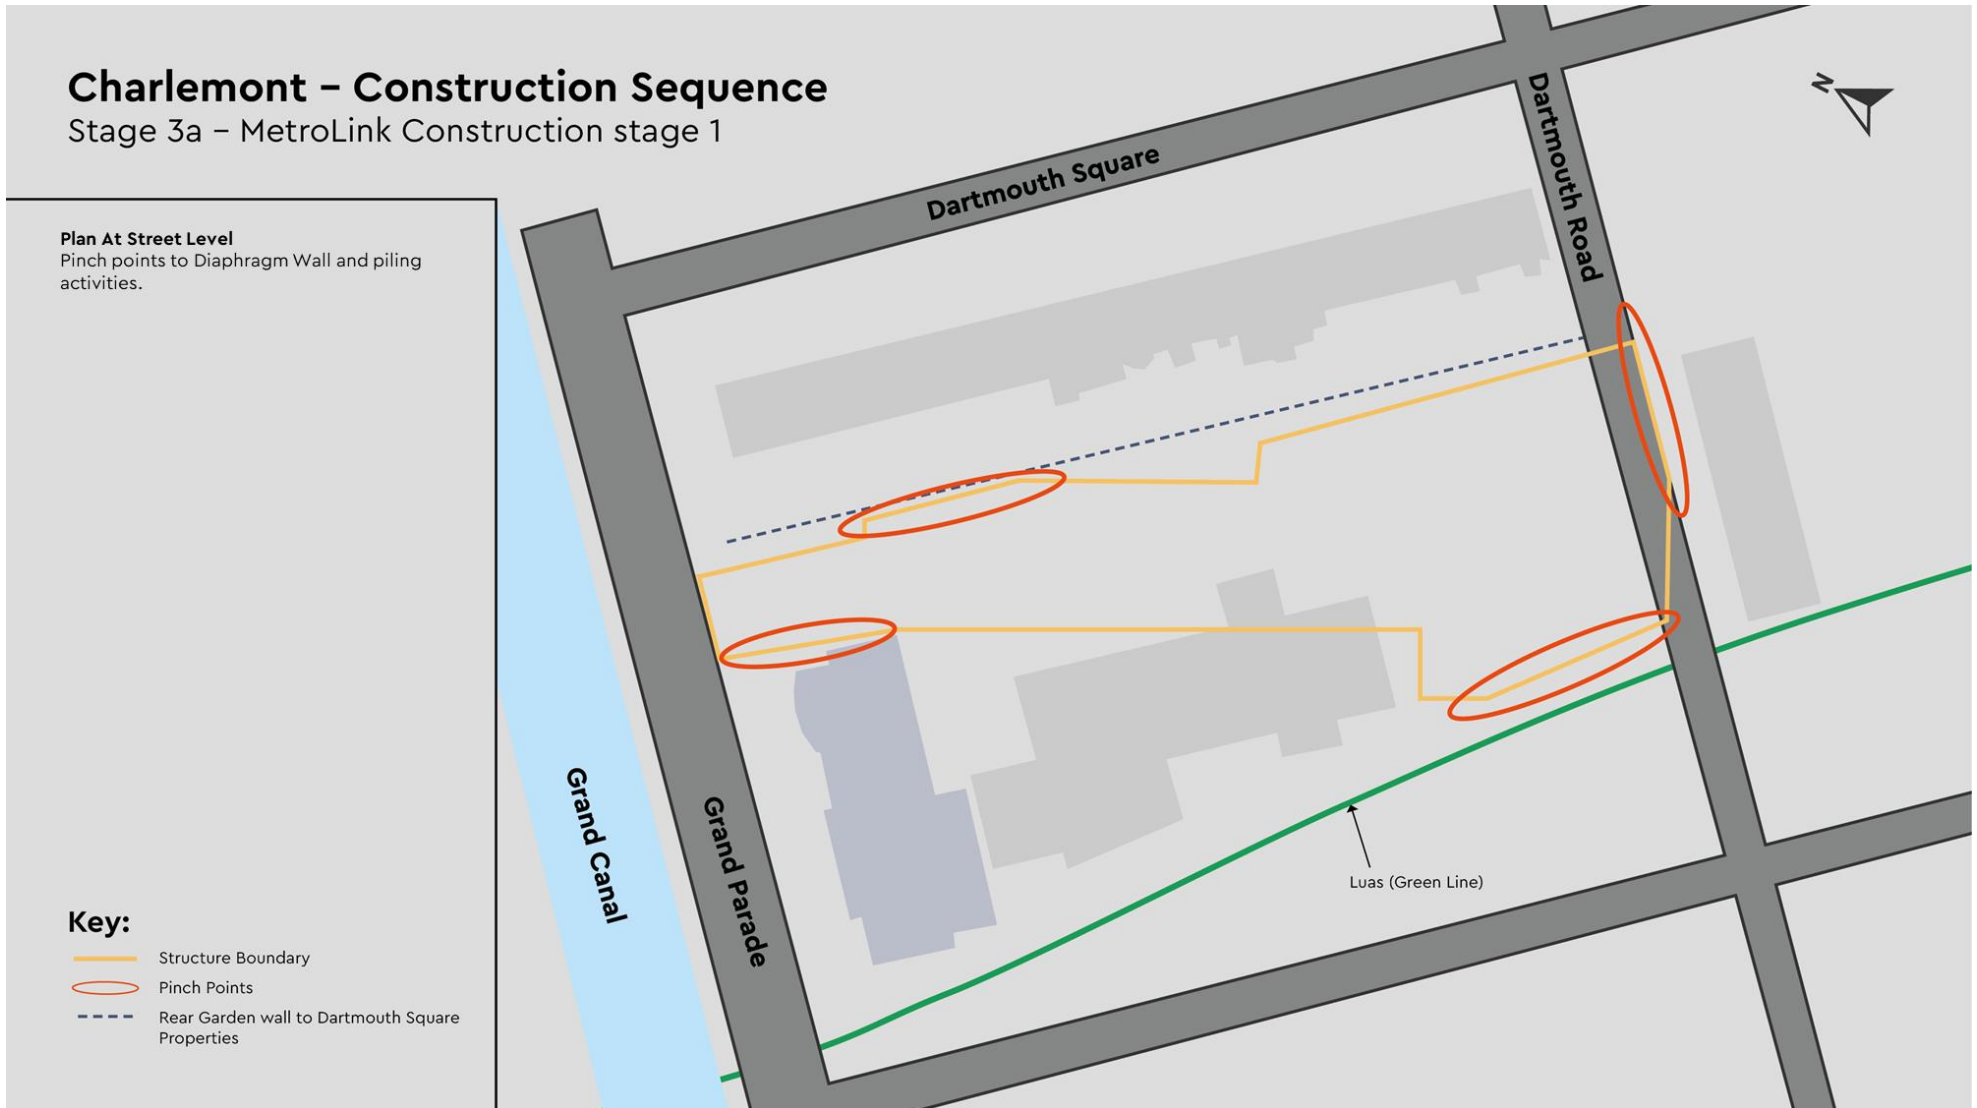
Charlemont Station - Stage 3a Metrolink Construction Stage 1
